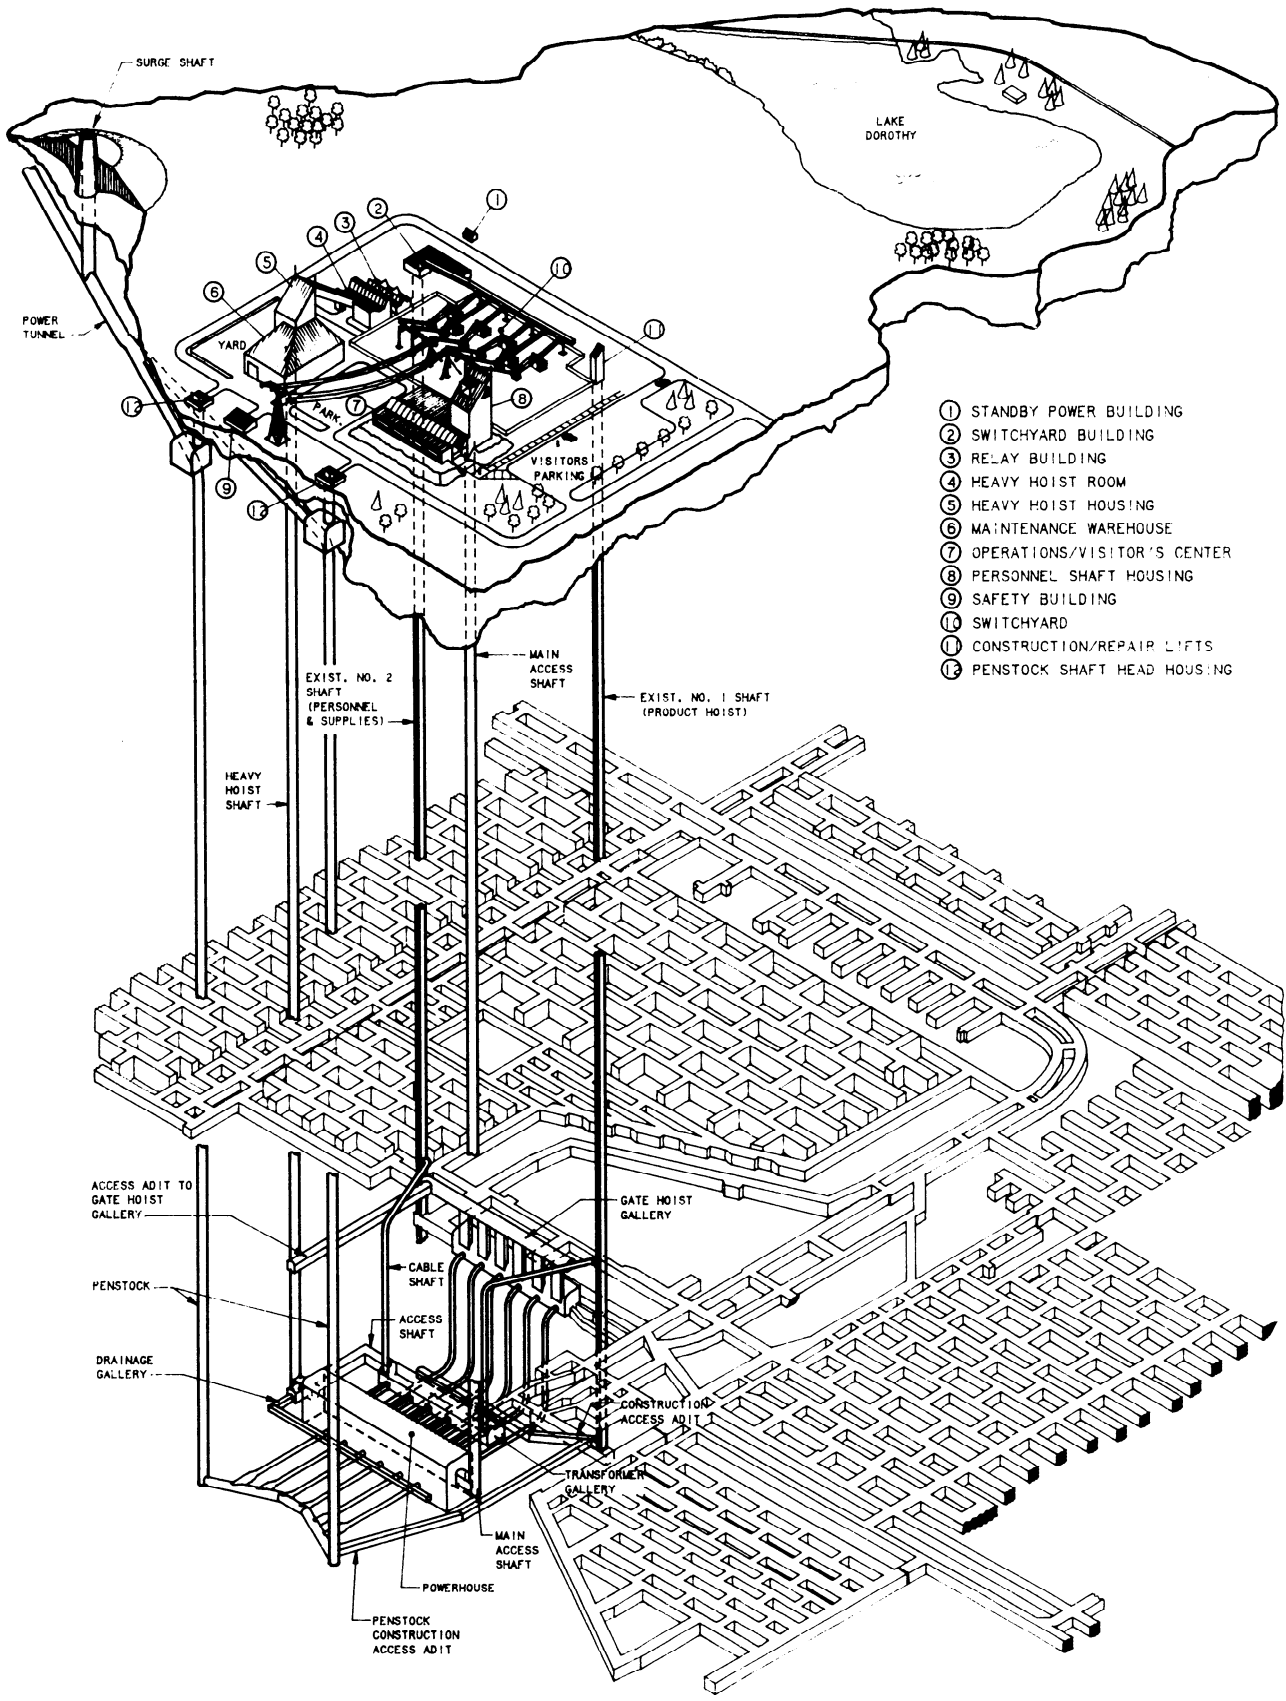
Proposed underground pumped storage facility using an existing mine.
